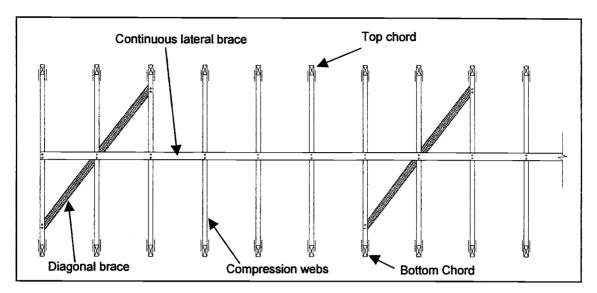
Section A-A: Lateral/Diagonal Bracing System
